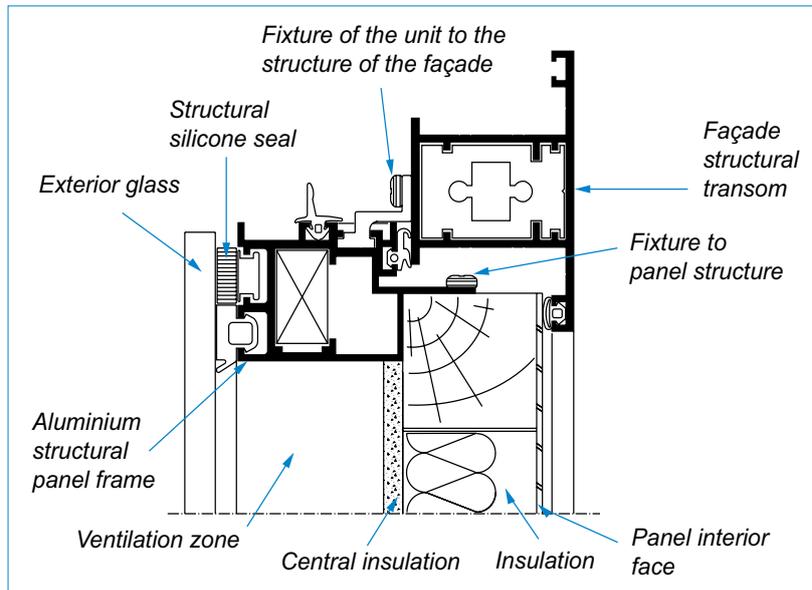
Mechanically assembled infill panel.
